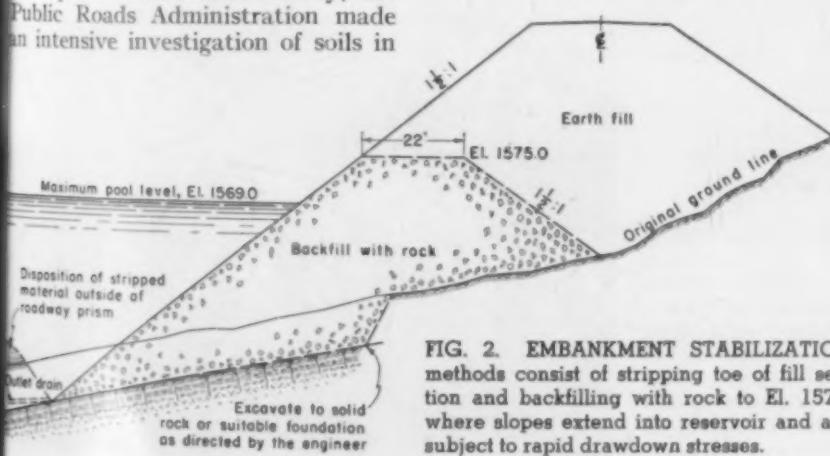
EMBANKMENT STABILIZATION methods consist of stripping toe of fill section and backfilling with rock to El. 1575, where slopes extend into reservoir and are subject to rapid drawdown stresses.
